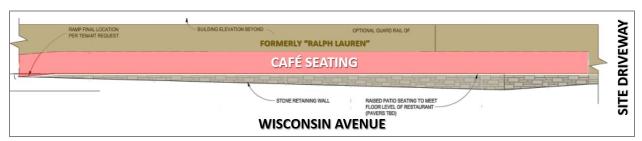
Wisconsin Avenue Outdoor Dining Space Expansion 82001021H (The Collection I; TSM Zone) (Architectural Elevation View)
